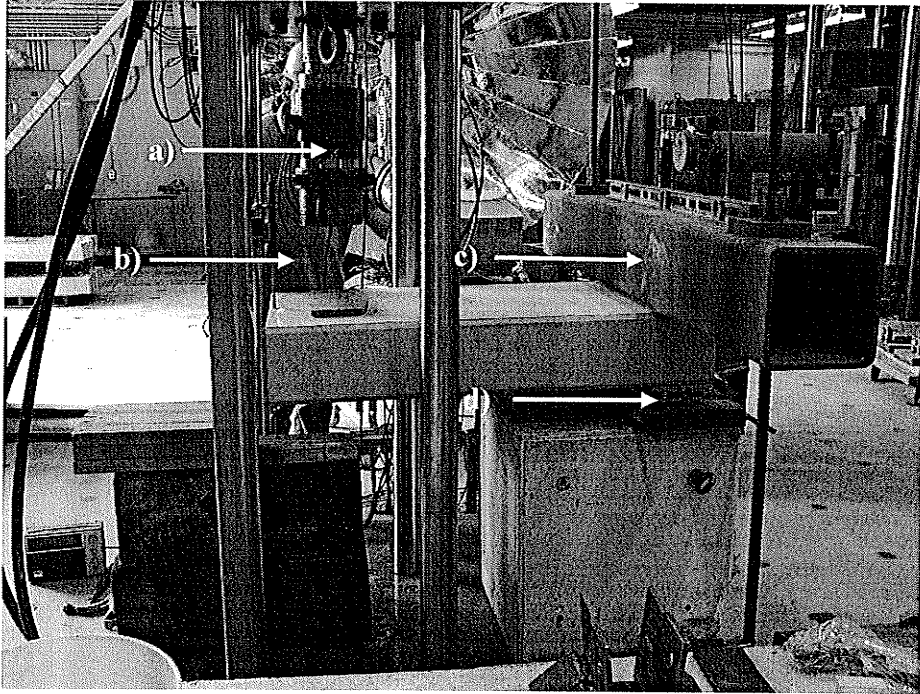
Cantilever bending test setup. a) actuator, b) LVDT for measuring tip deflection, c) HSS section stressed to strong floor, d) contoured bearing plate to distribute support reactions.
